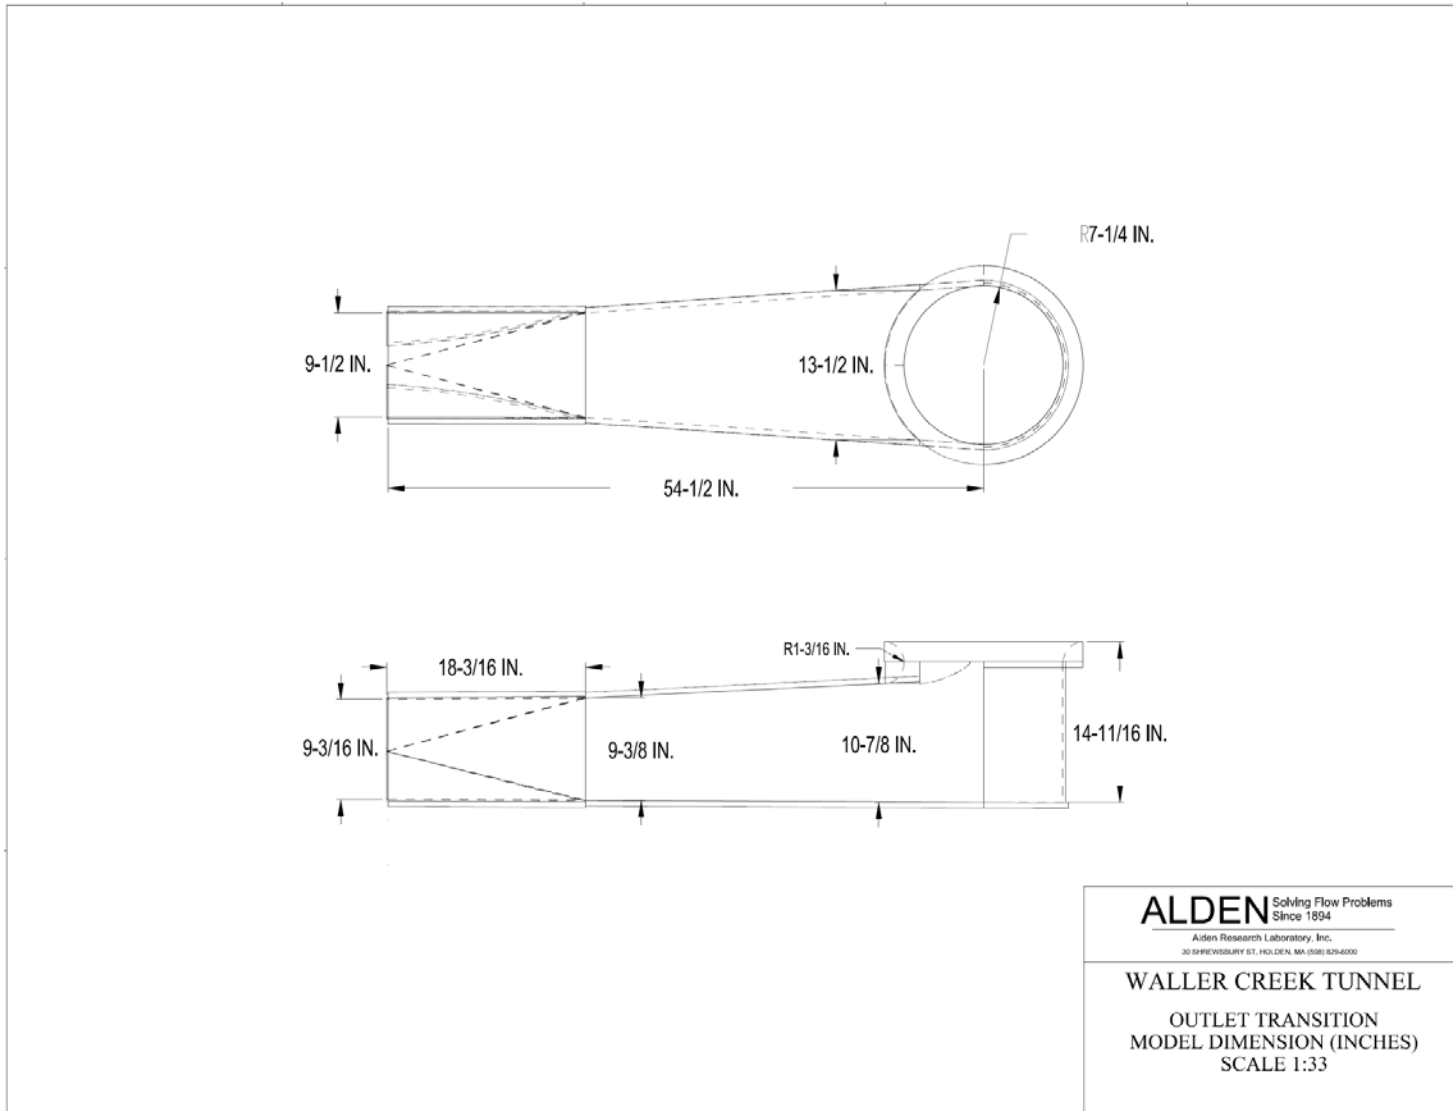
Waller Creek Tunnel Project; 1:33 Scale Model Outlet Transition Dimensions
